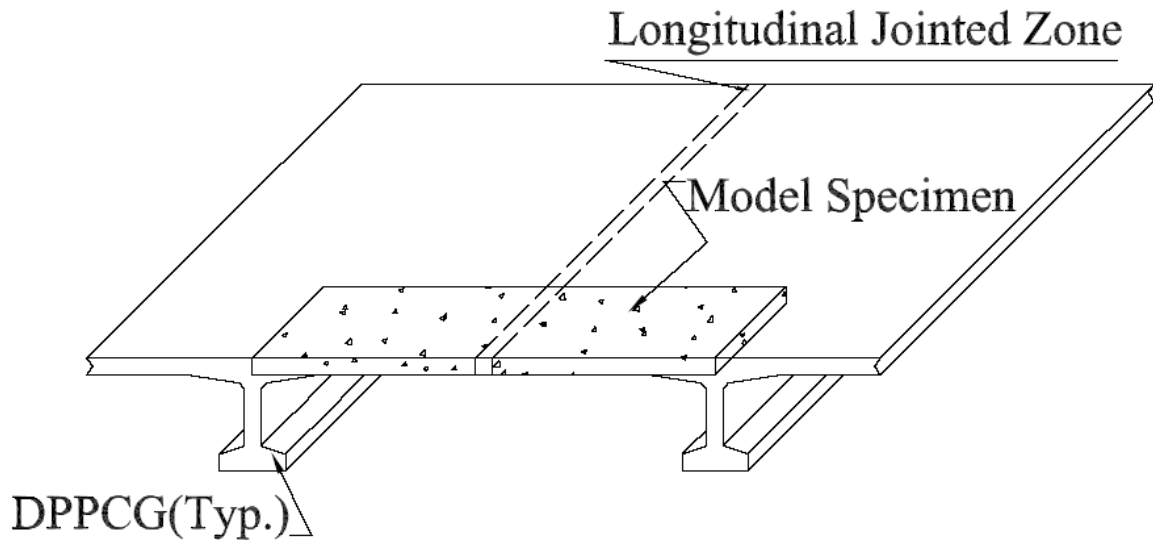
SLAB SECTION FROM ADJACENT SLABS
